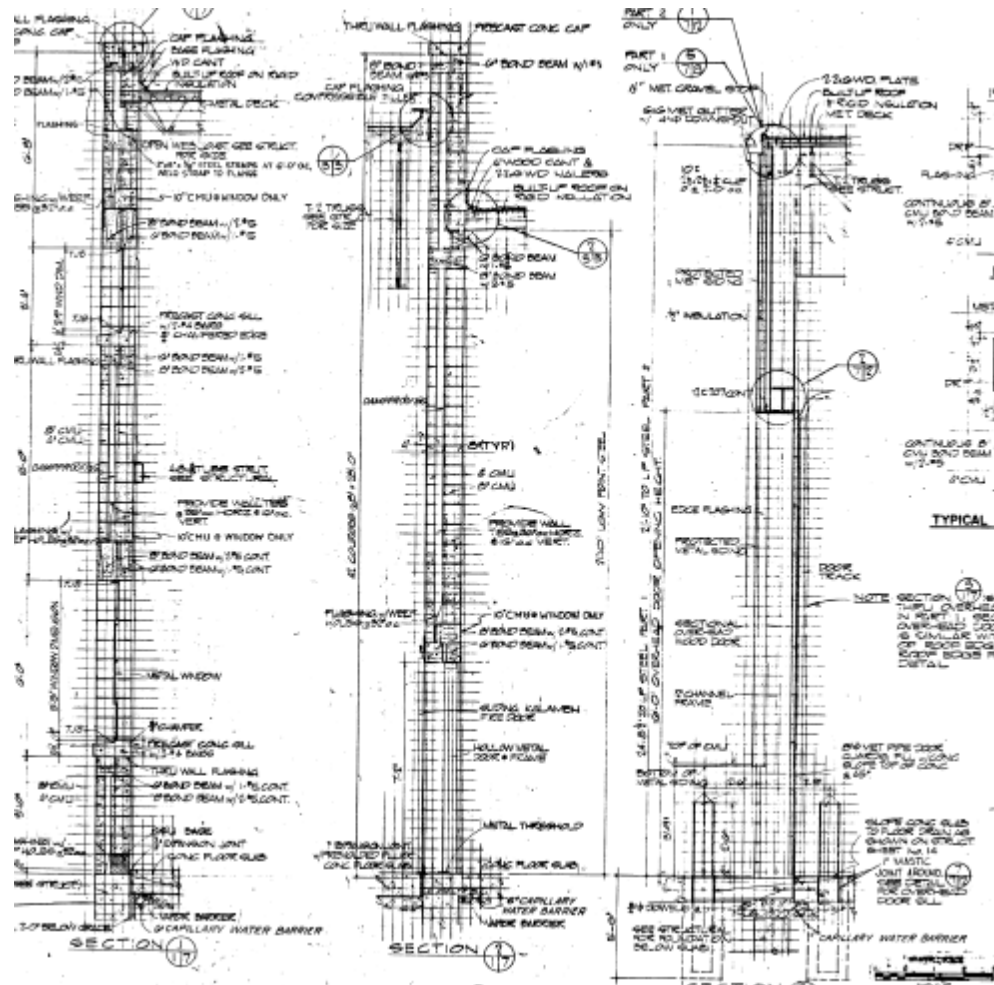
Tactical Equipment Maintenance Facility wall sections, Bldg 3492, Fort Carson, CO.
